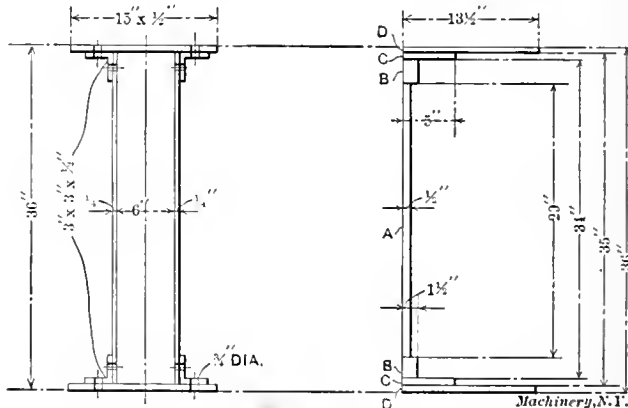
Proposed Section of Girder, drawn to convenience for Calculation
